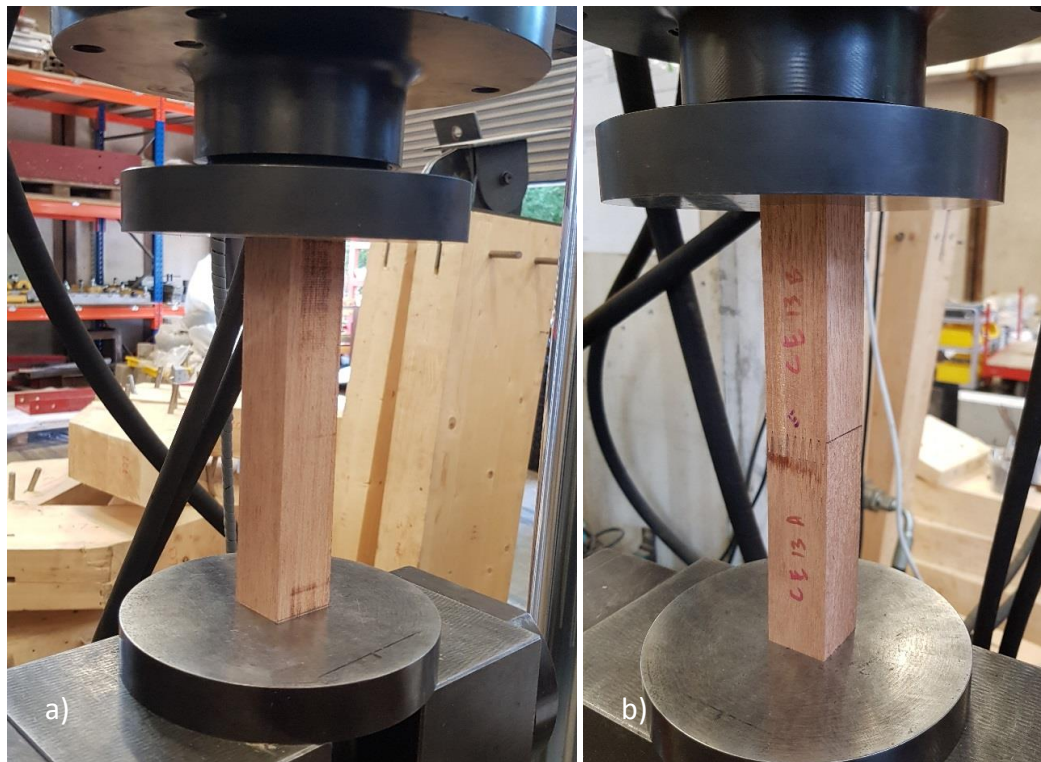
Compressive test set-up a) solid; b) finger-jointed specimen
